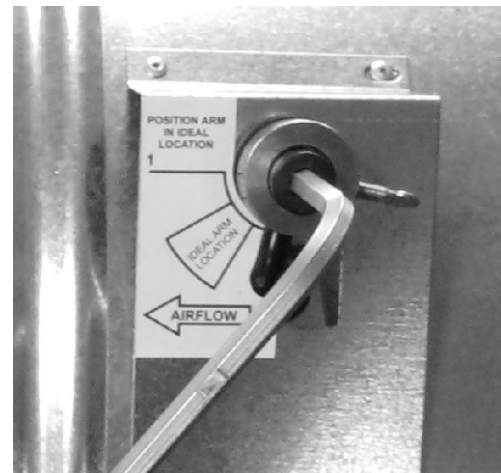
CLOSE-UP VIEWS OF ASSEMBLY
